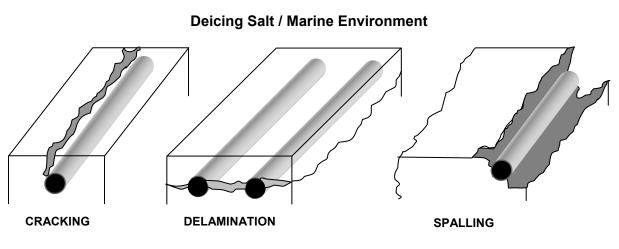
Cracking, Spalling and Delamination of Reinforced Concrete Due to Corrosion Damage (Adapted from Young, 1998)
